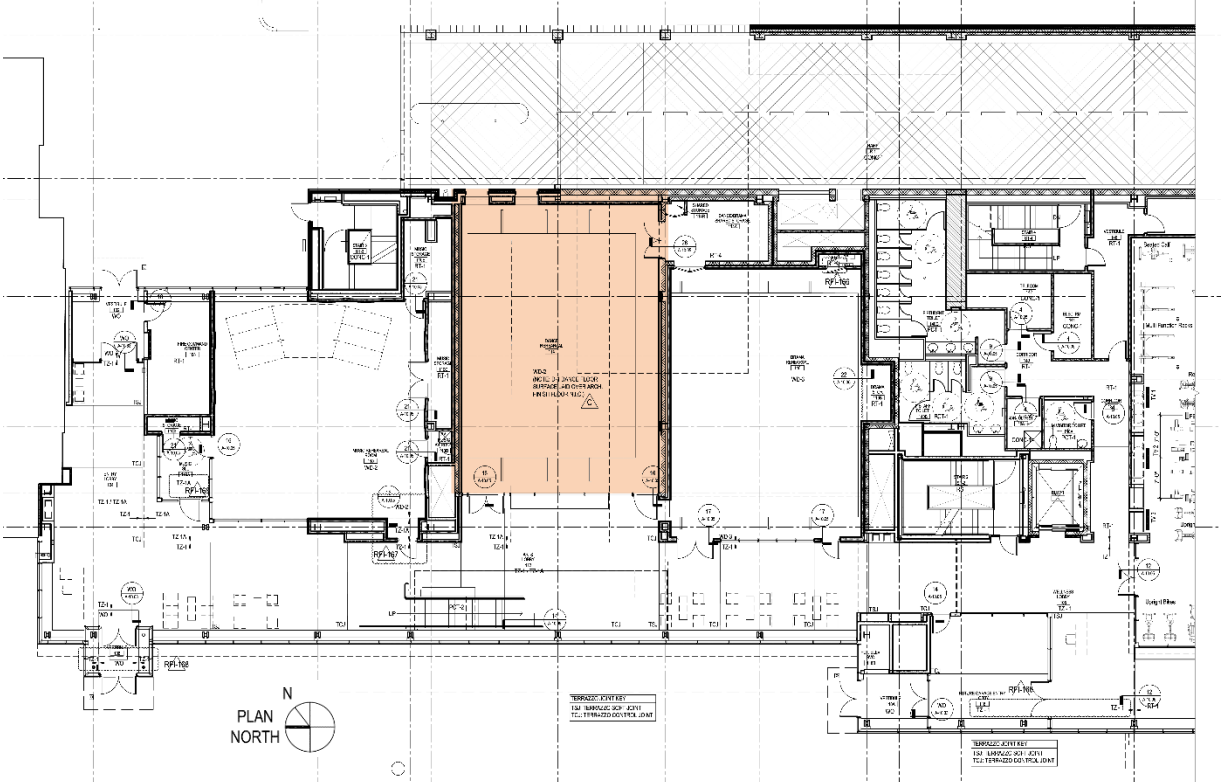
First Floor "North" Plan – Dance Rehearsal Room
